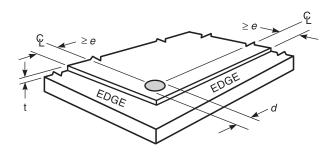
A—Edge Distances for Arc Spot Welds (see 2.3.5.2)
